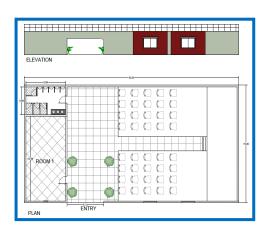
Proposal Planning & Design of Community Hall MEASUREMENT SHEET (ROOM)
